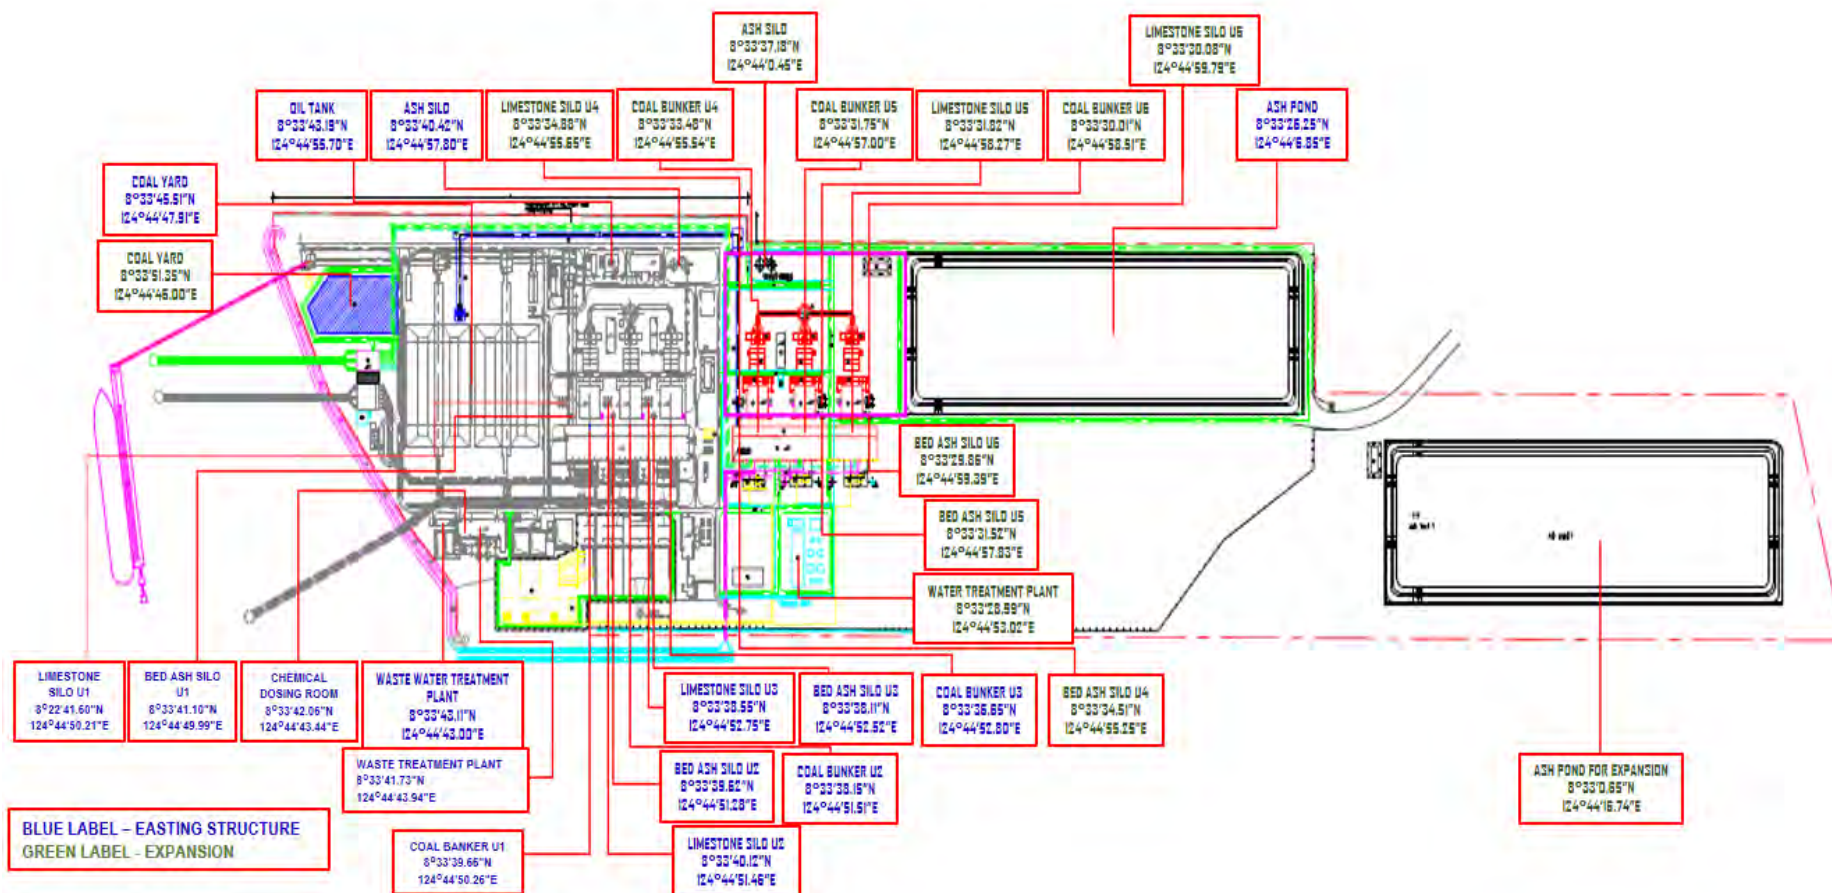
Existing Plant Layout Superimposing Therein the Layout of the Expansion Facilities
